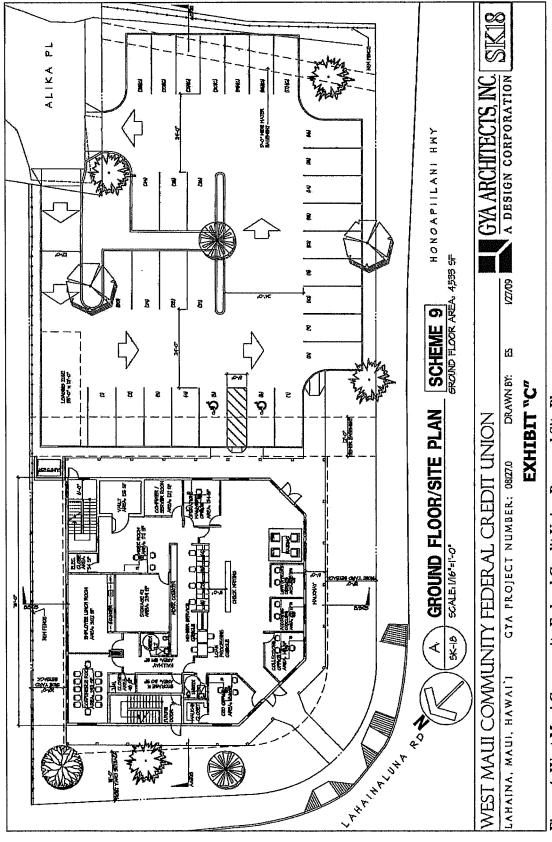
West Maui Community Federal Credit Union Proposed Site Plan.
